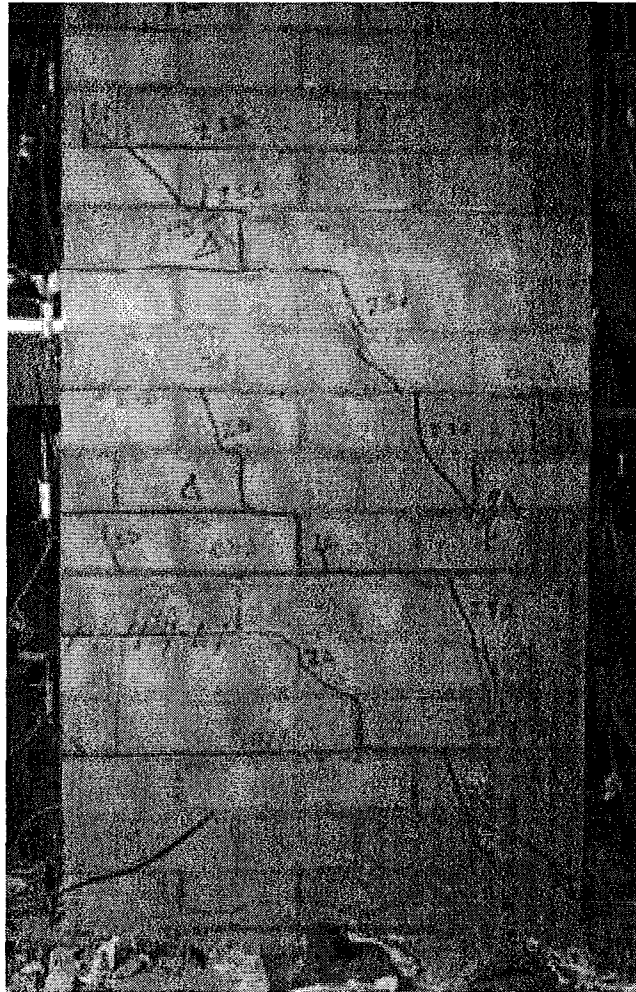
Wall 1 - Bed Joint Cracking at  $\Delta_y$
